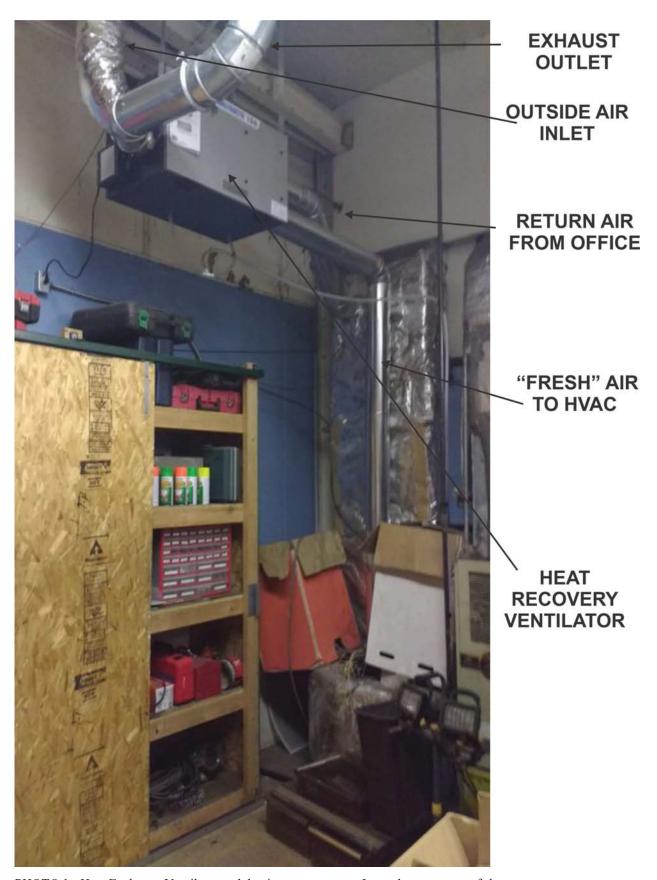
Heat Exchange Ventilator and ducting components. In northwest corner of shop.
